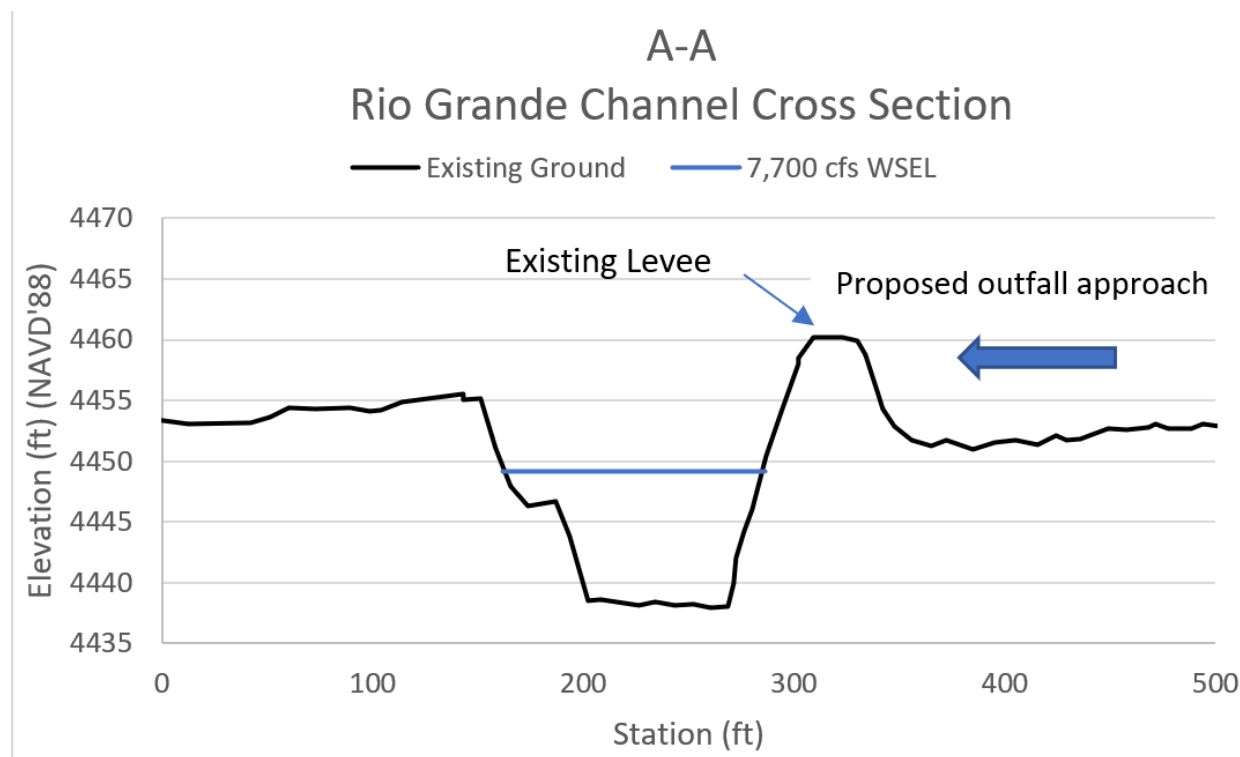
Cross-sectional elevation profile of Section A-A in Figure 2, looking downstream. The main river channel is in the center.
